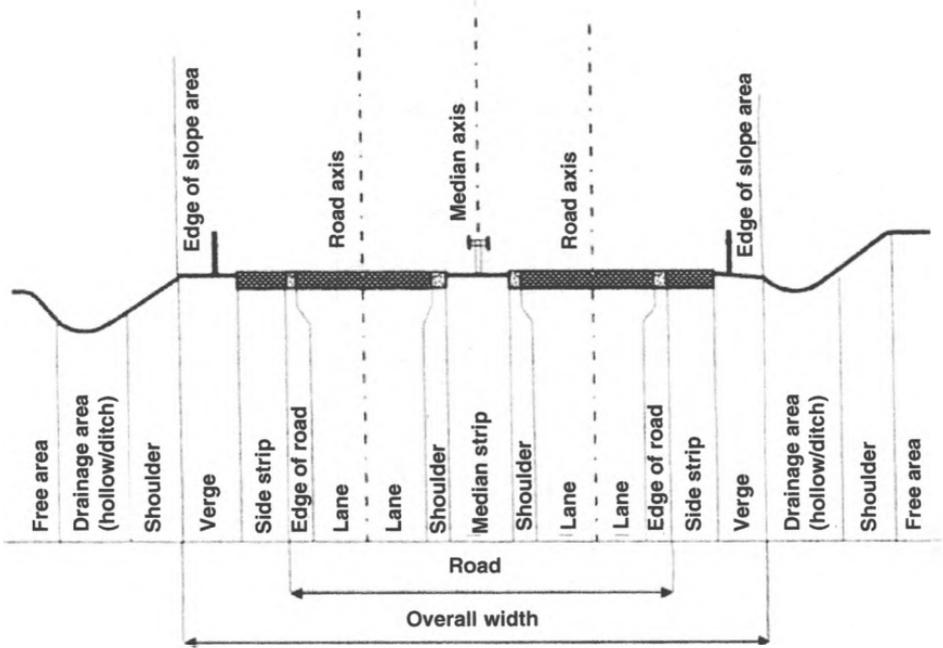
Cross section elements of a divided highway or freeway with four lanes (rural road)
